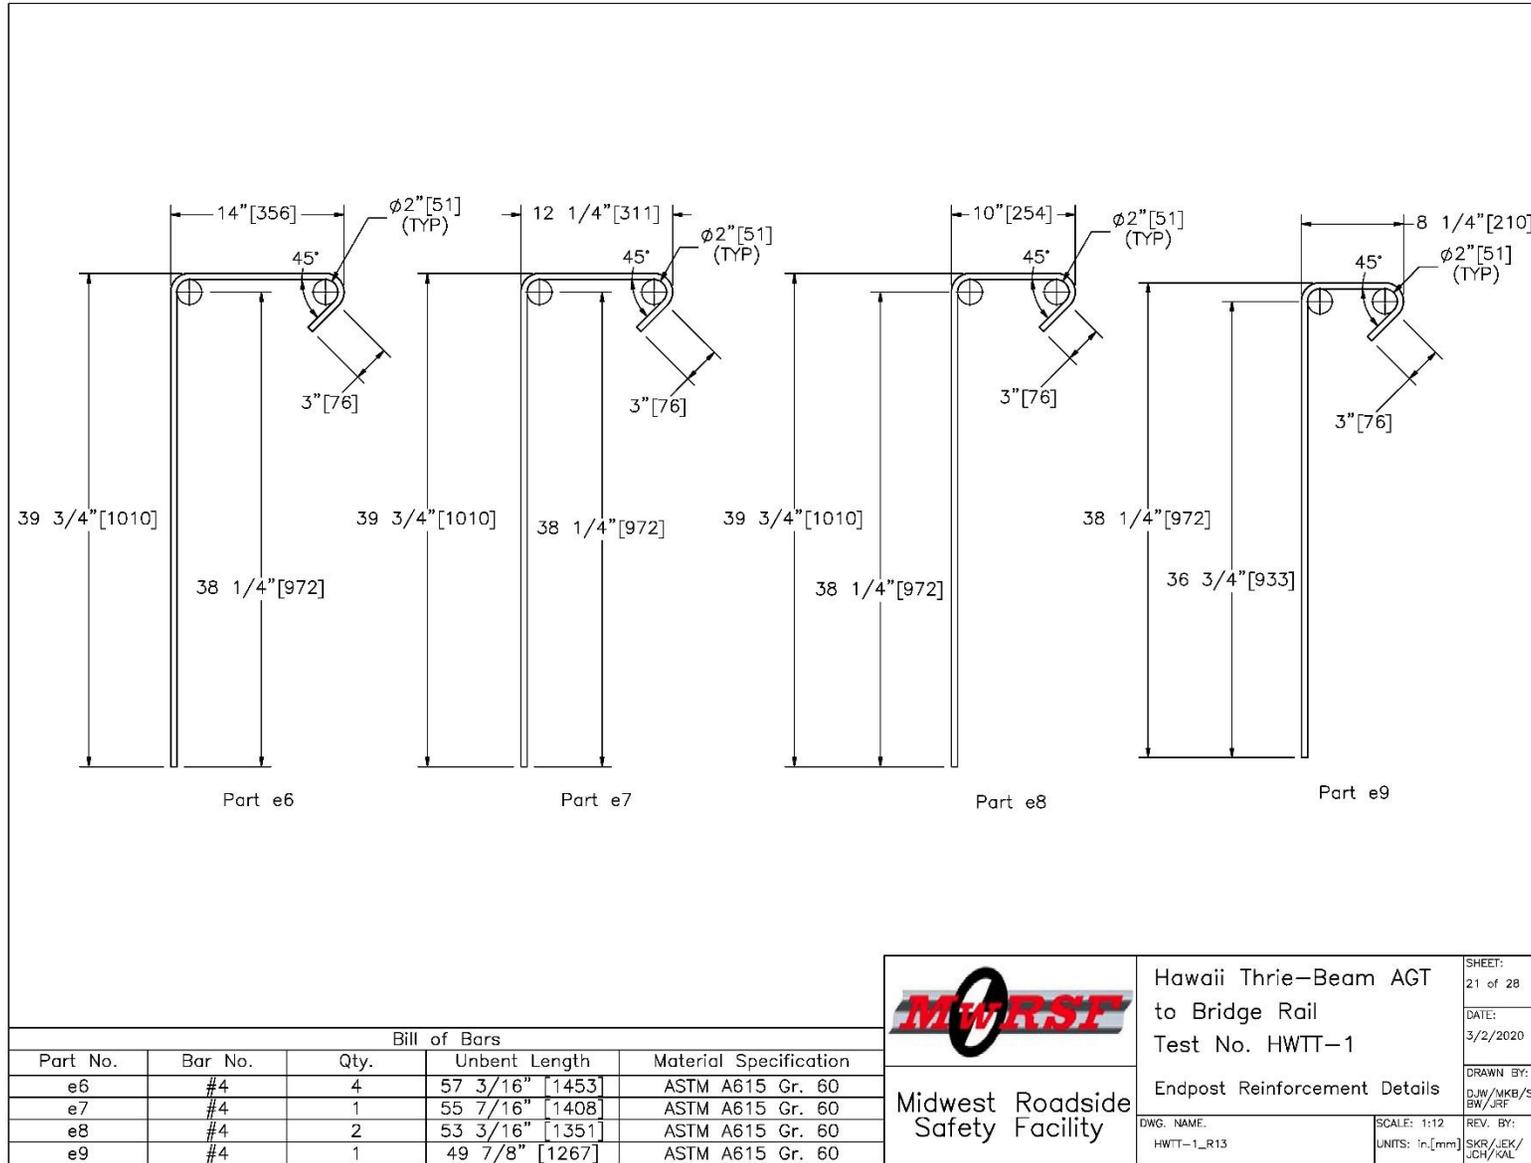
End Post Reinforcement Details, Test Nos. HWTT-1 and HWTT-2
